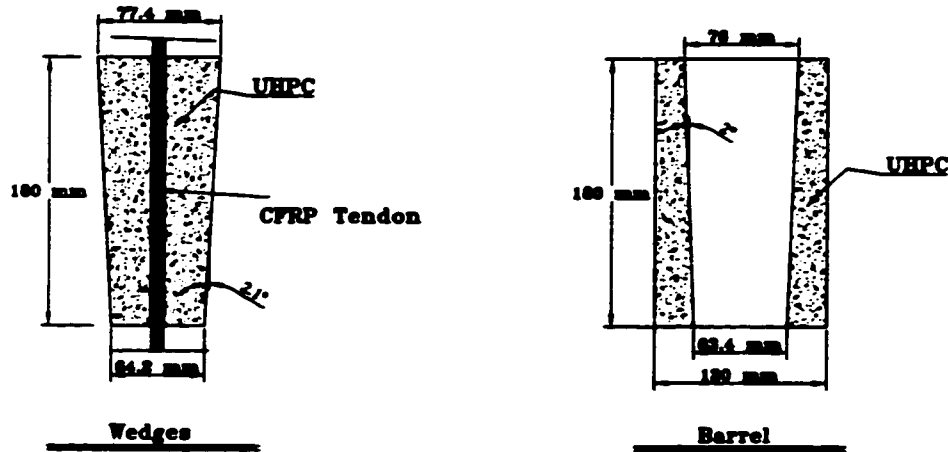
Proposed dimensions of the non-metallic anchorage system.
